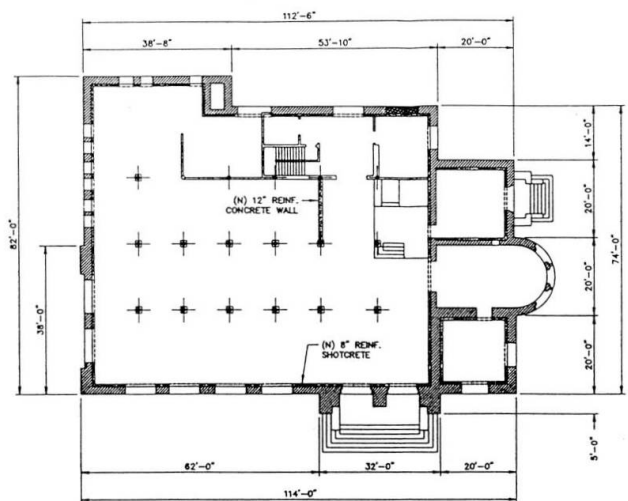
Proposed strengthening of San Jose Museum of Art - First Floor Plan.
